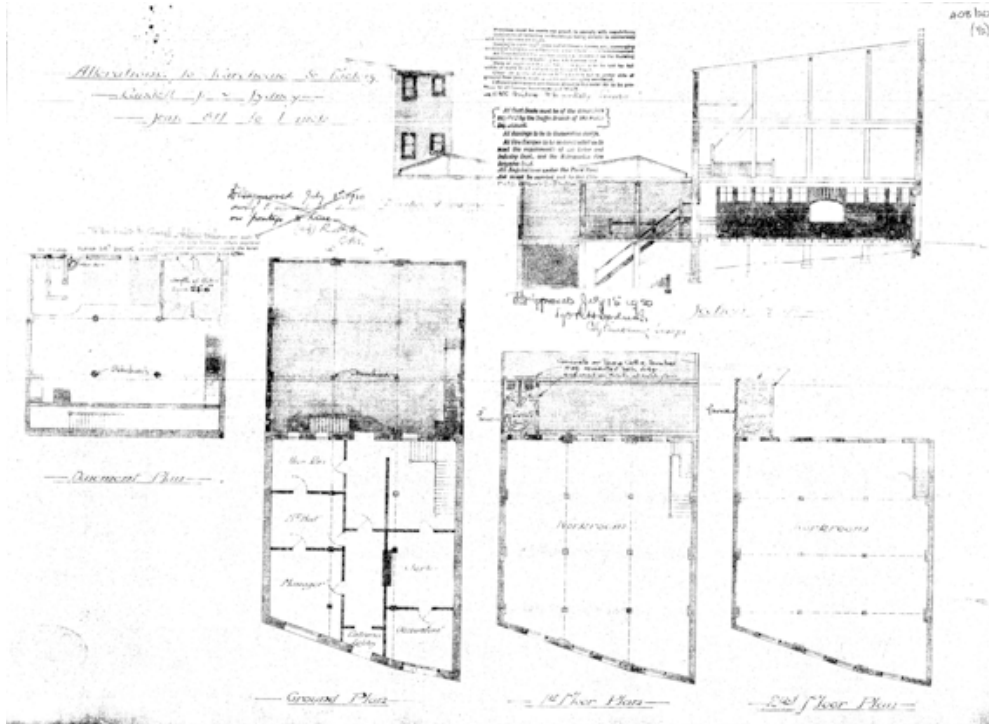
Plan of additions made in 1920 to the rear of the building
